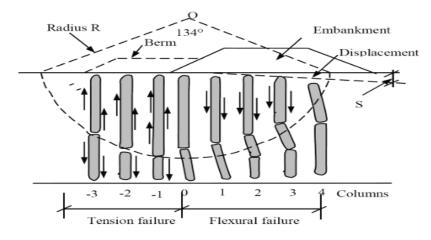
Possible Failure Modes of Columns (Broms, 1999)
